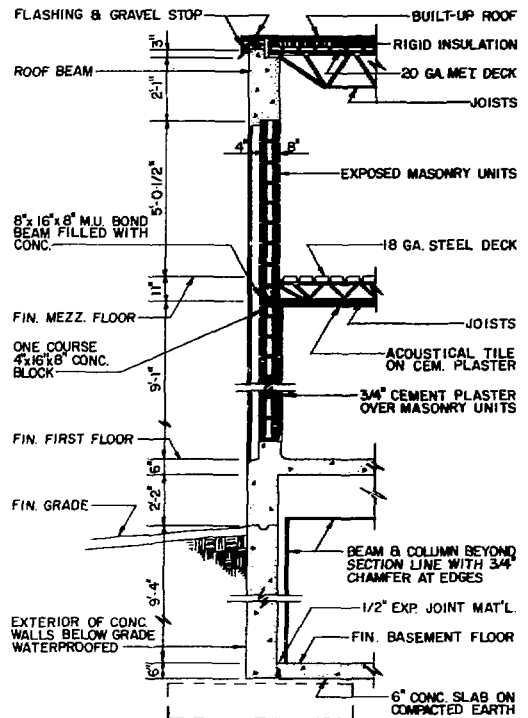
Typical wall section, Buildings 2, 3, 4, and 5.
